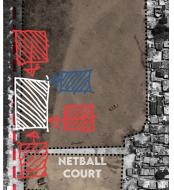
Site intervention concept sketch, (Author, 2021)
